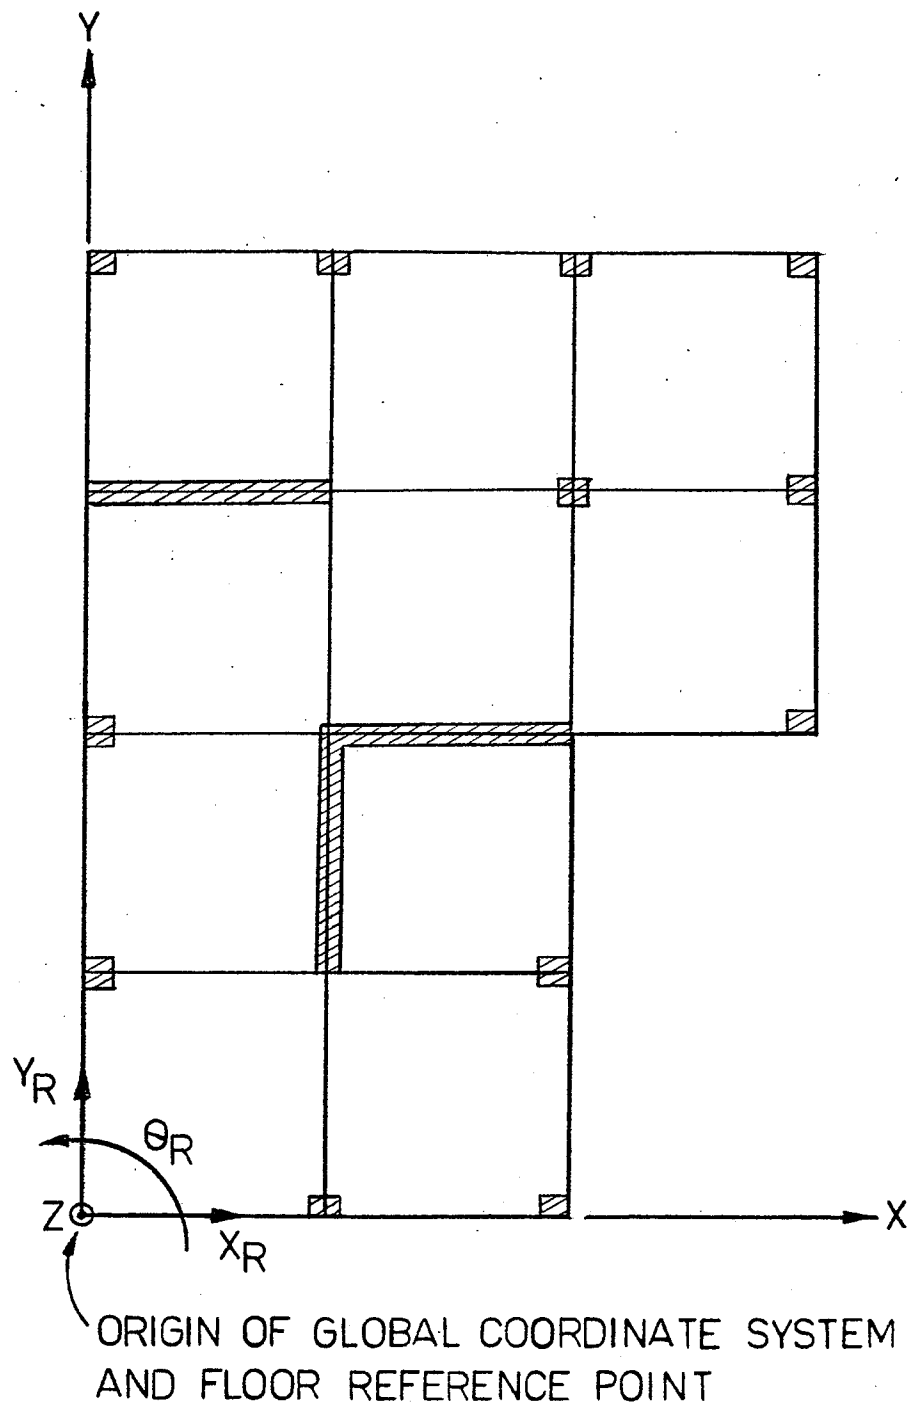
FLOOR PLAN SHOWING GLOBAL COORDINATE SYSTEM AND FLOOR REFERENCE POINT
